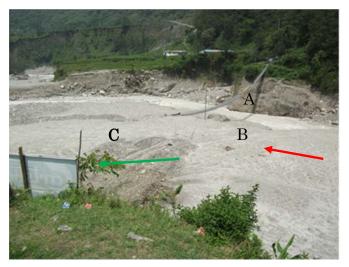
Assumed processes of floods at Kharapani Bridge
